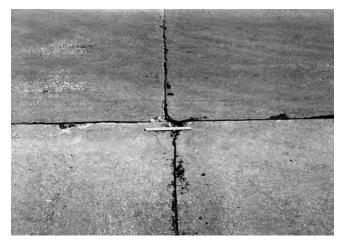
Low-Severity Spalling, Corner
